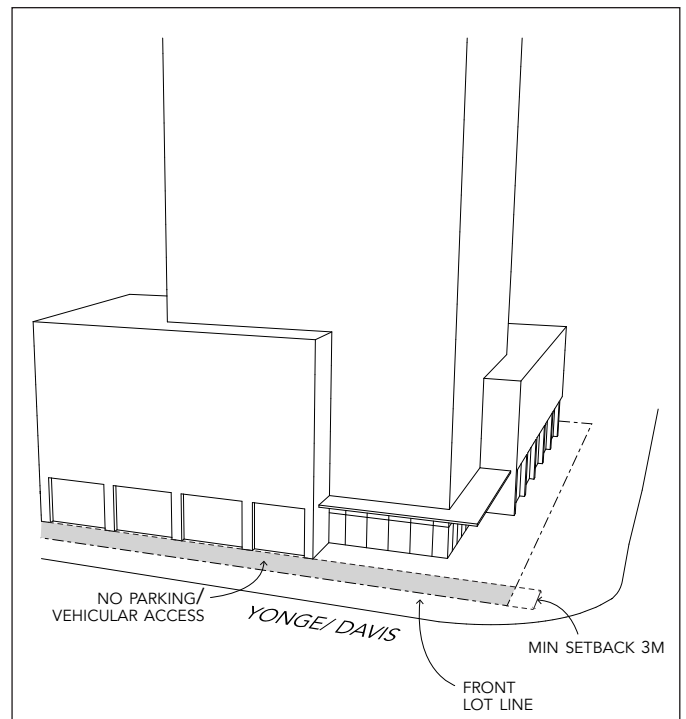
Example of Setback on Yonge Street or Davis Drive
